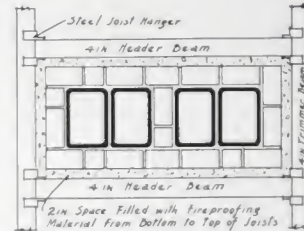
FLOOR FRAMING AROUND CHIMNEY IN PARTY WALL, TO SECURE PROPER SPACE BETWEEN ENDS OF JOISTS.
